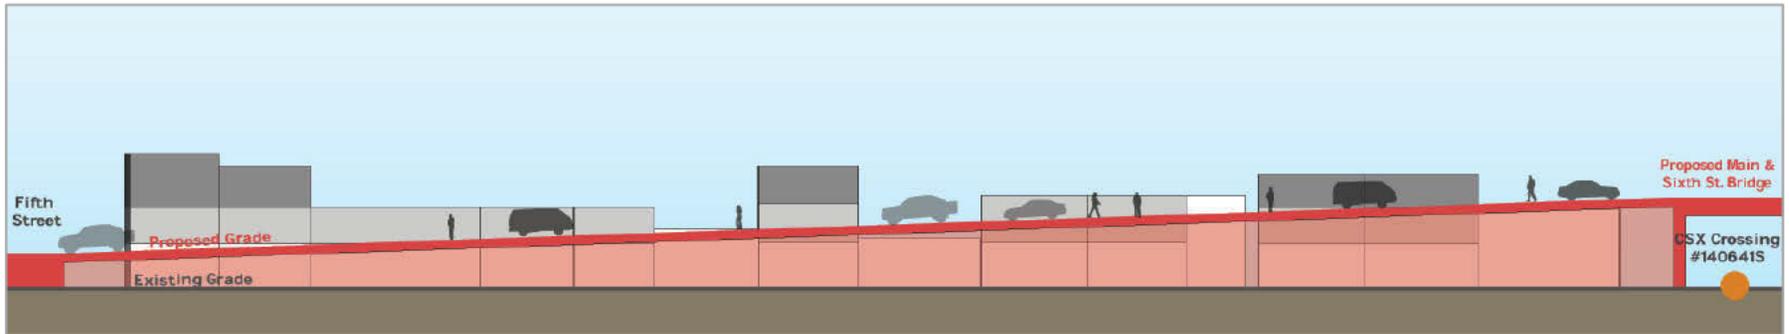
Alternative A Section/Elevation, south facing along 500 block of Main Street
